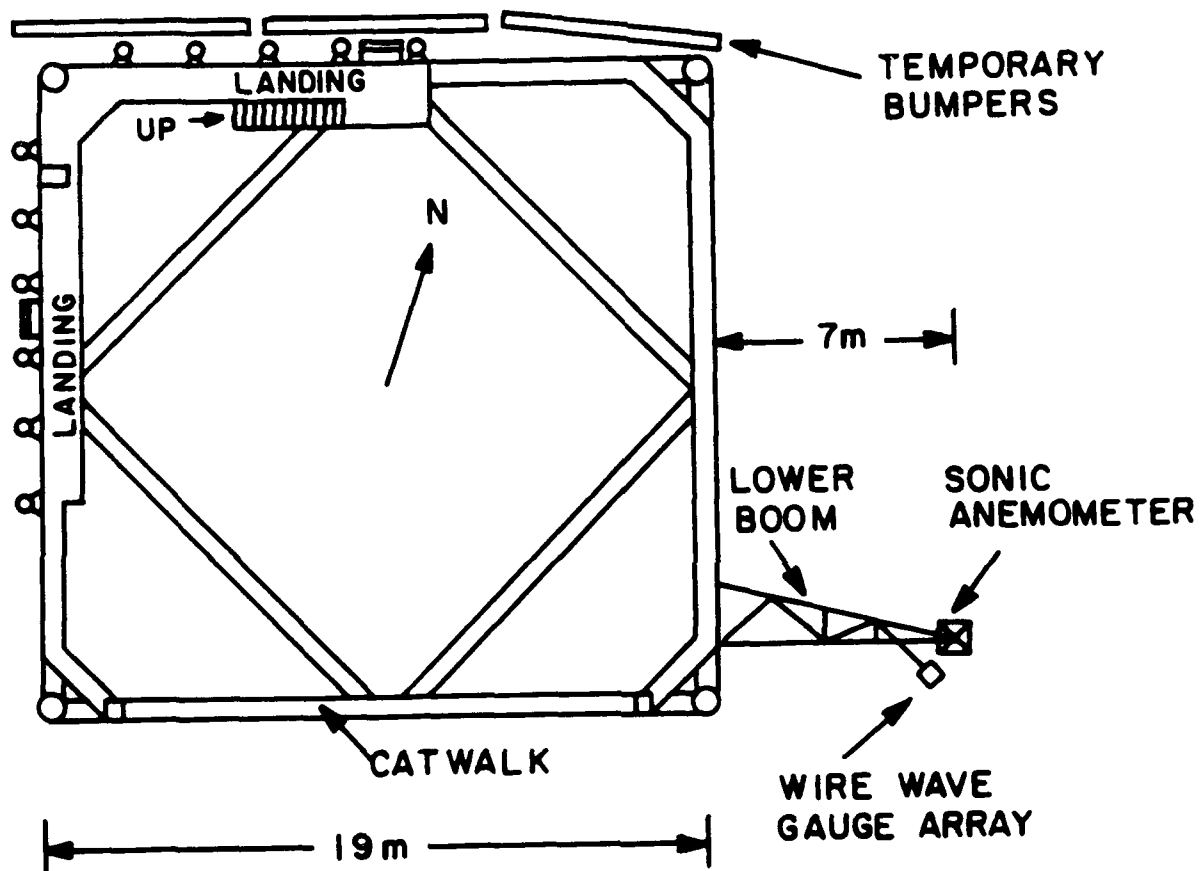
Plan diagram of CLT catwalk elevation showing location of lower instrument boom, permanent landing along NW quadrant, and temporary bumpers along the north side.
